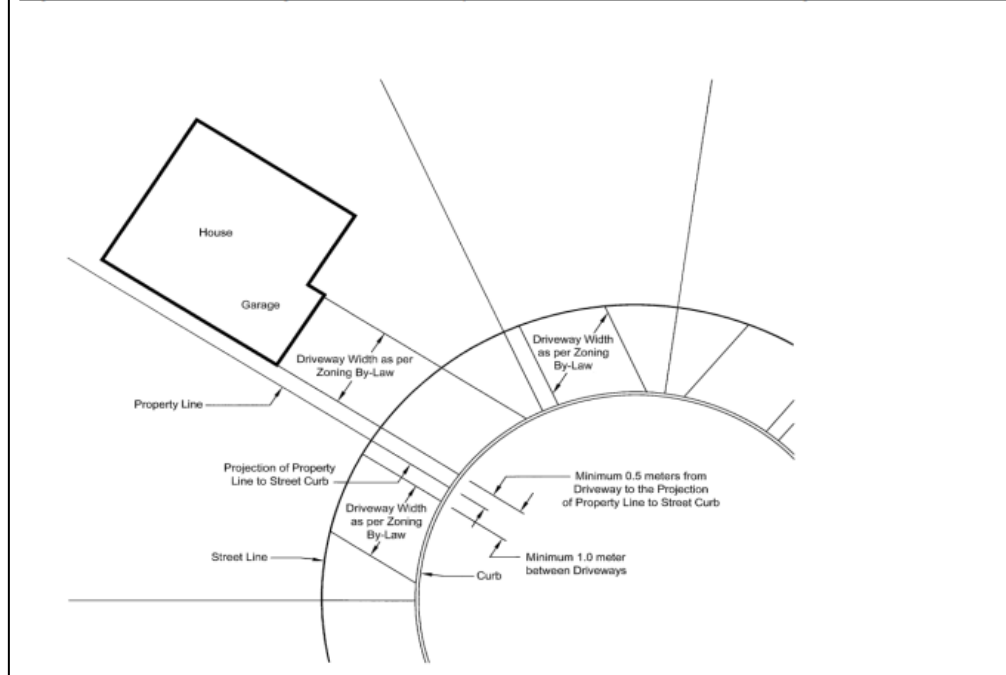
Minimum spacing between driveways at the Street Curb - Curve or Angle Bend in the Street
